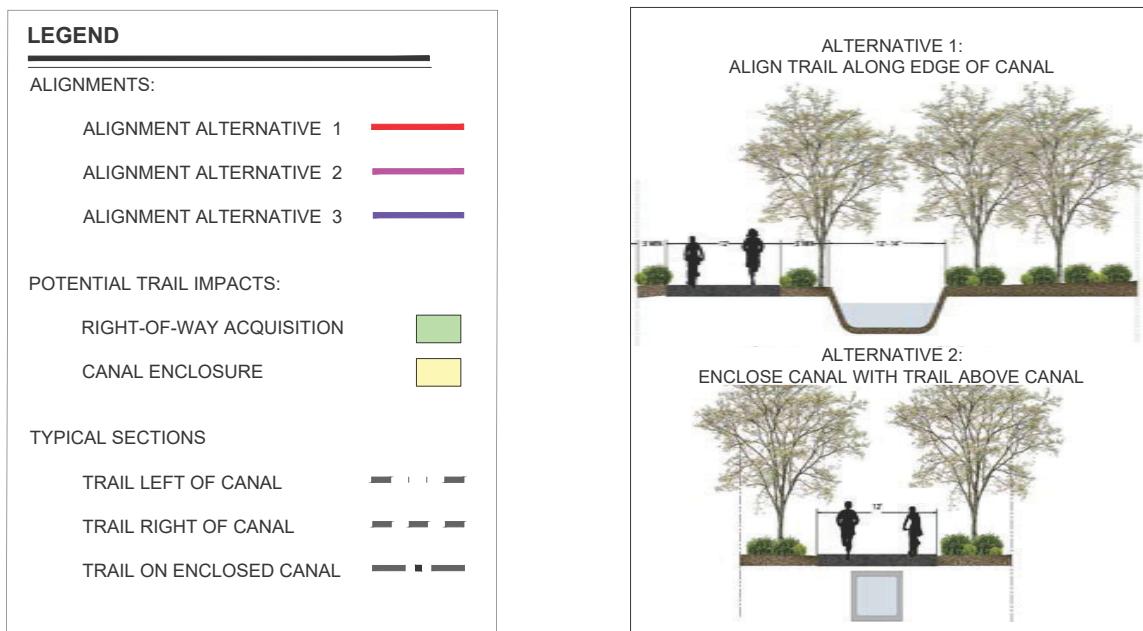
Proposed alignment along the Jordan and Salt Lake City Canal, sheet 2.
